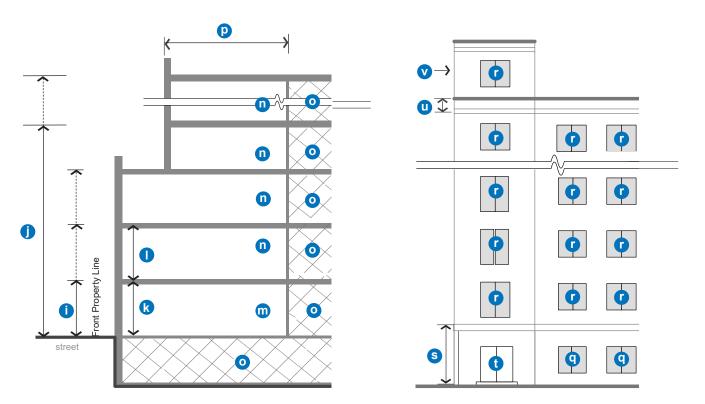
(B)(2) General Stoop Building: Height and Use Requirements
